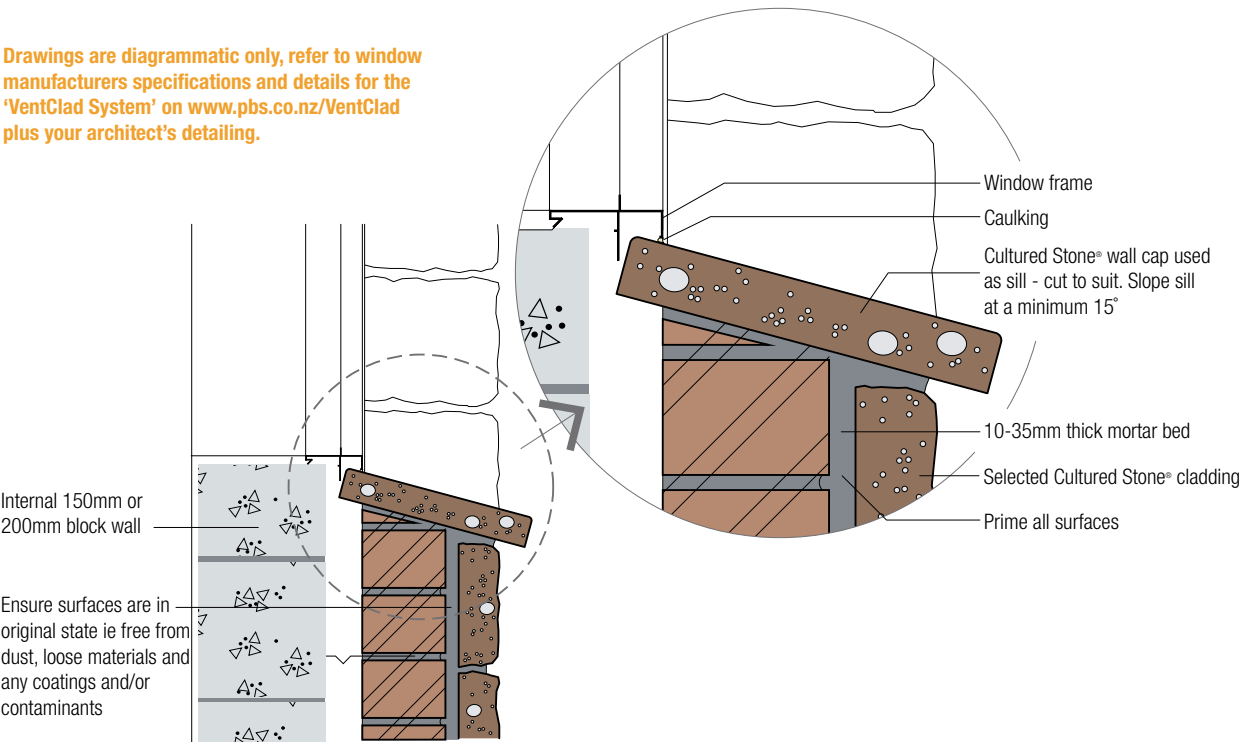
Sill at Window - Section (Dwg # CS-06.06)
